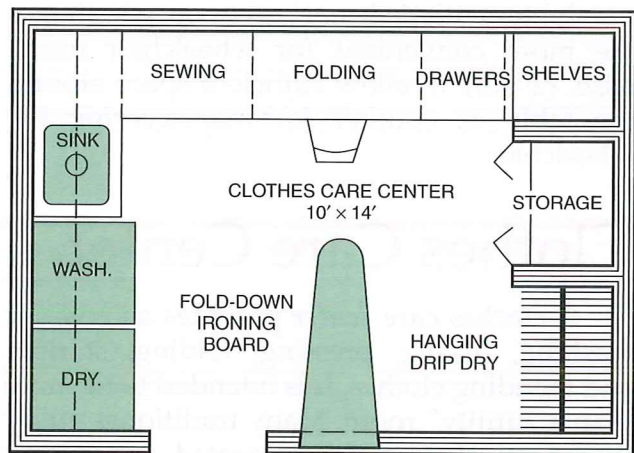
This well-designed clothes care center has all the facilities for washing, drying, pressing, folding, storing, and mending.
